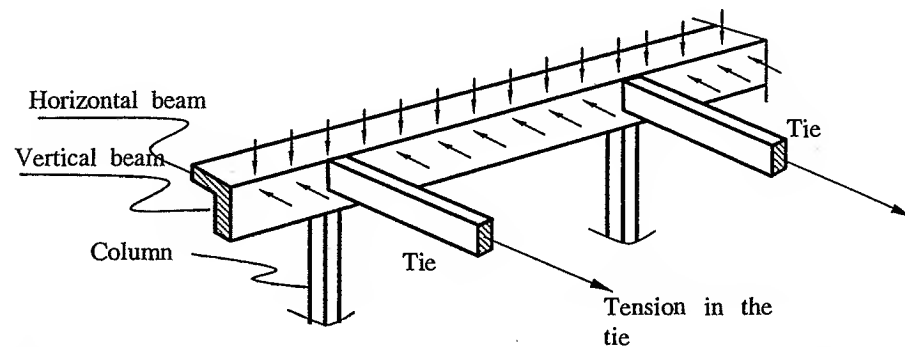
Vertical and horizontal beams of arched-slab system
